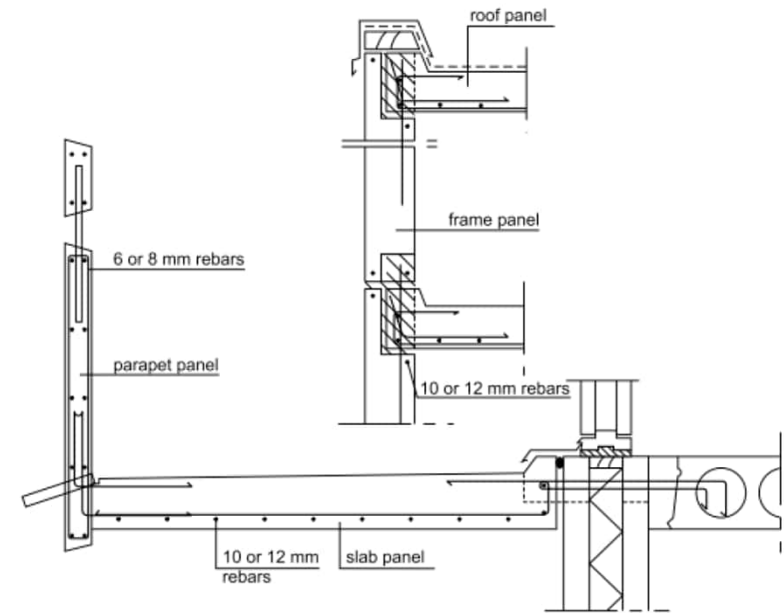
Cross-section of a typical Finnish balcony made of precast structural members (Pentti 1994).
